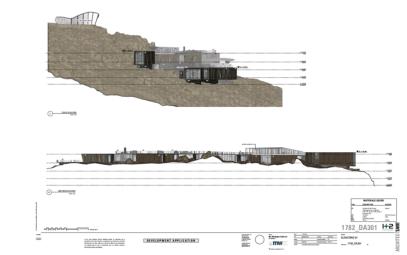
Extract: 1782_DA301 ELEVATIONS 01
